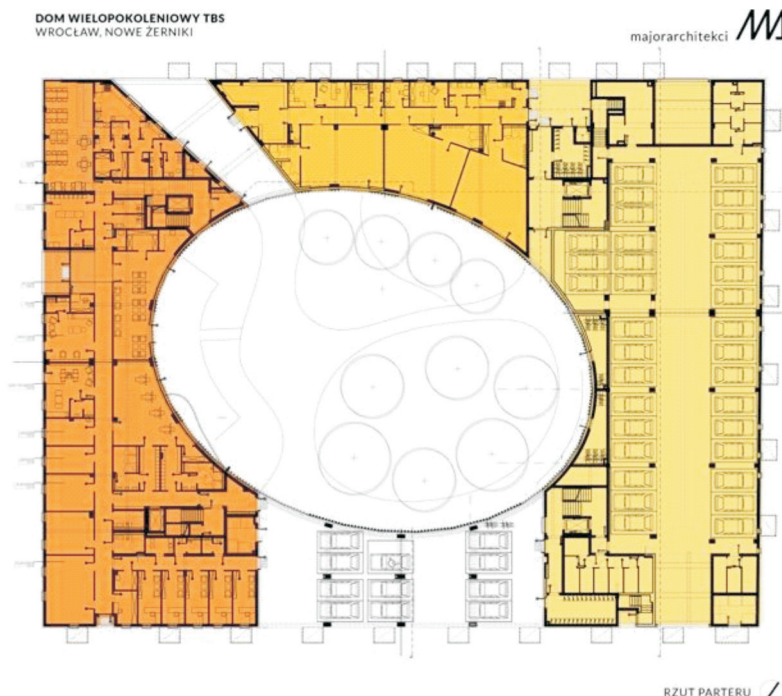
Ground floor plan of the multigenerational house in Wrocław
